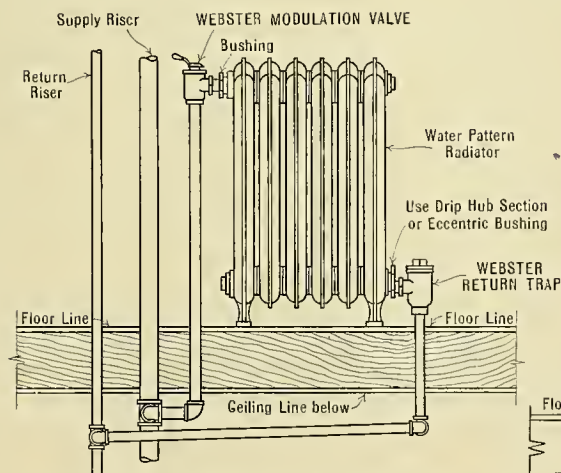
Arrangement of connections to a radiator in a factory or loft building where there is no objection to branch run-outs on the ceiling of the floor below
